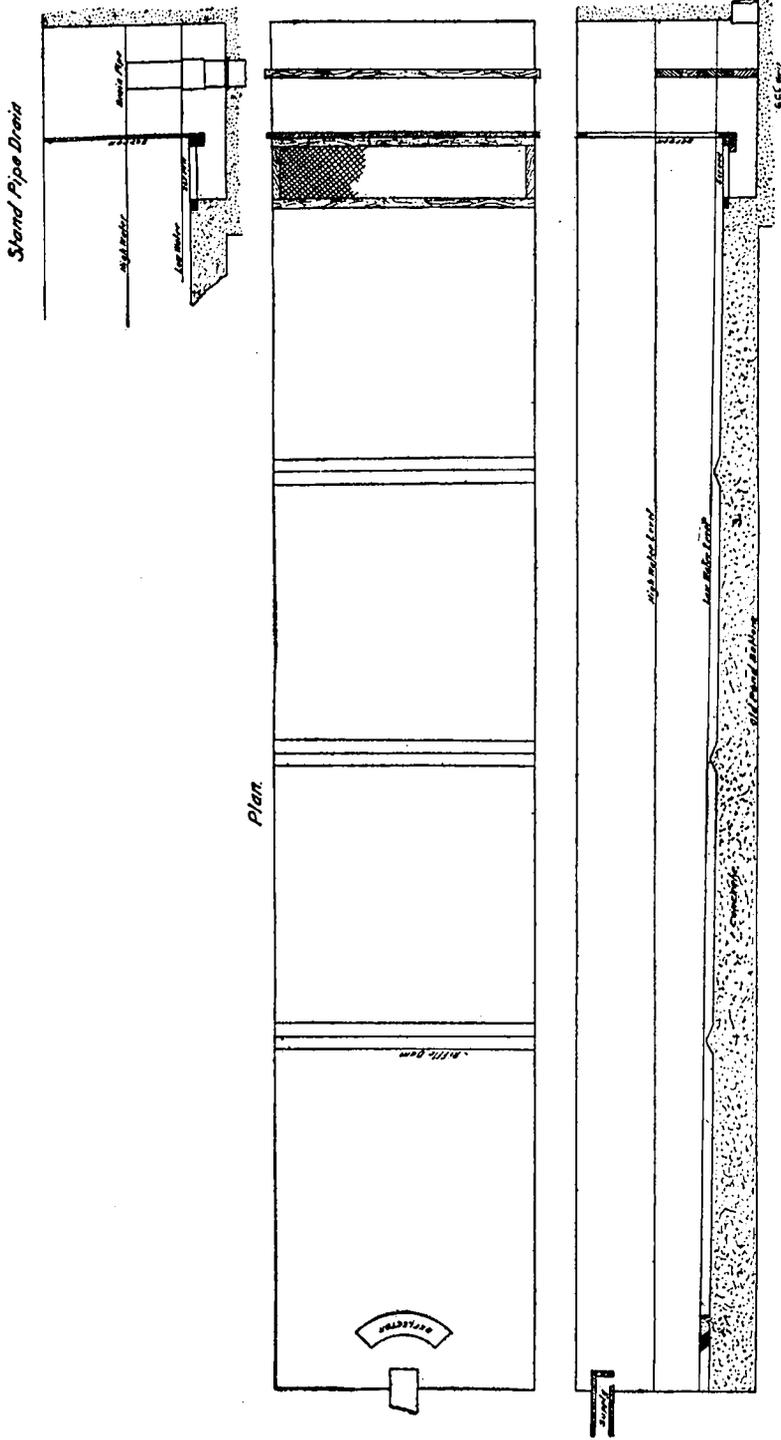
Plan of Seagle rifle rearing pond for trout.
